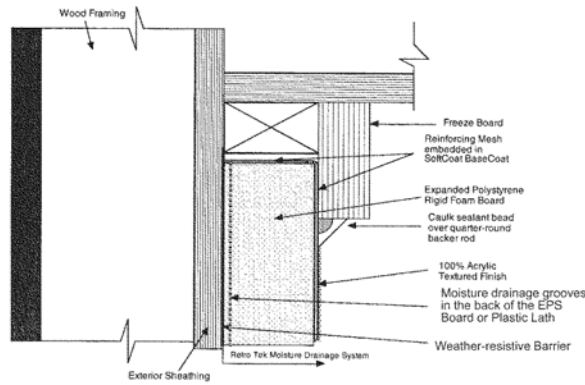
TYPICAL HARDCOAT PM INSTALLATION DETAILS
